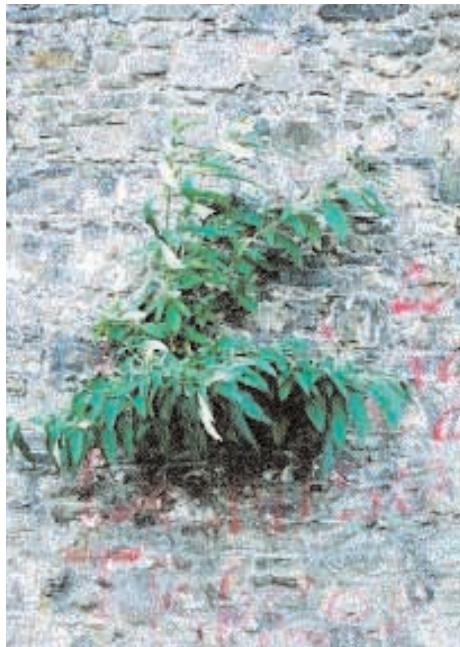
Vegetation and graffiti to the Cook Street section of the wall.
